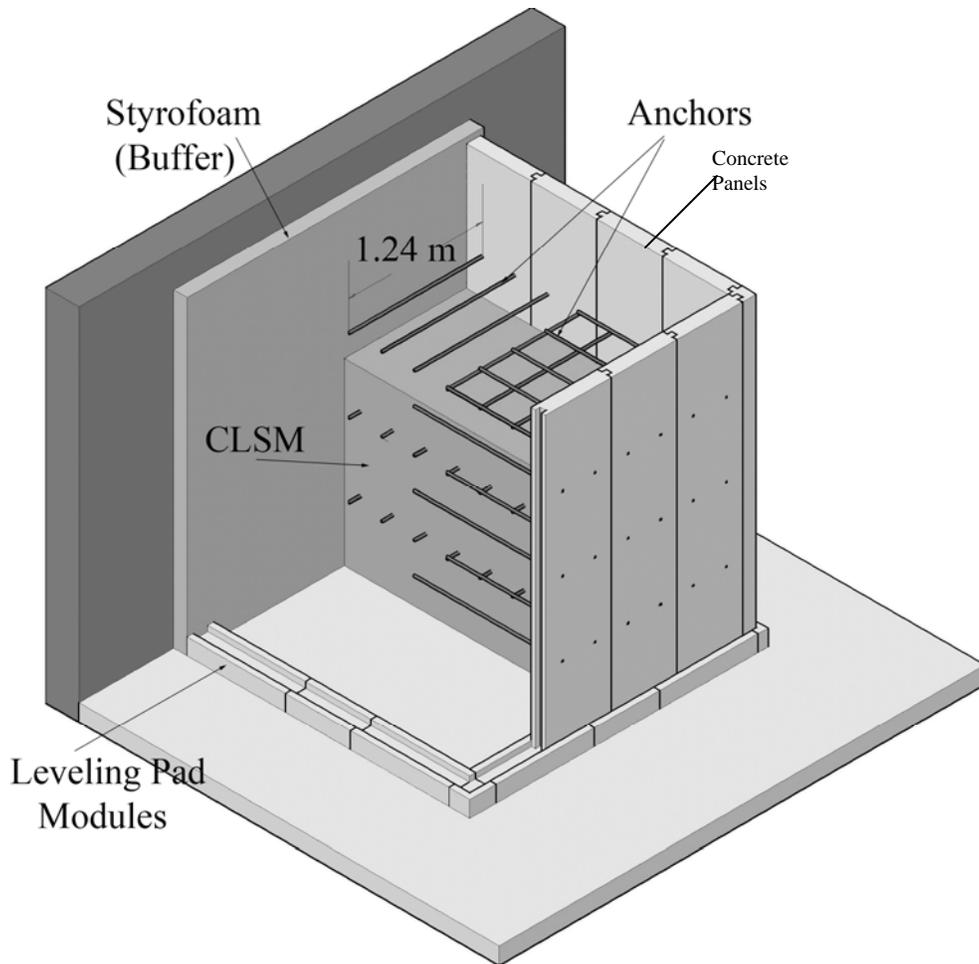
Embedded Anchors in CLSM Backfilled Abutment
